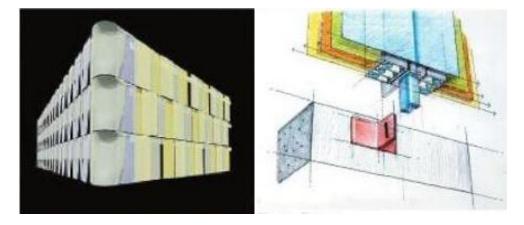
Design proposals for a textile building envelope. Left: Rendering of building with a facade covered in a multi layered fabric composite. Source: (Fernández, 2006, p. 277). Centre: Multi layered composite consisting o f several layers of fabric. Source: (Fernández, 2006, p. 277).
